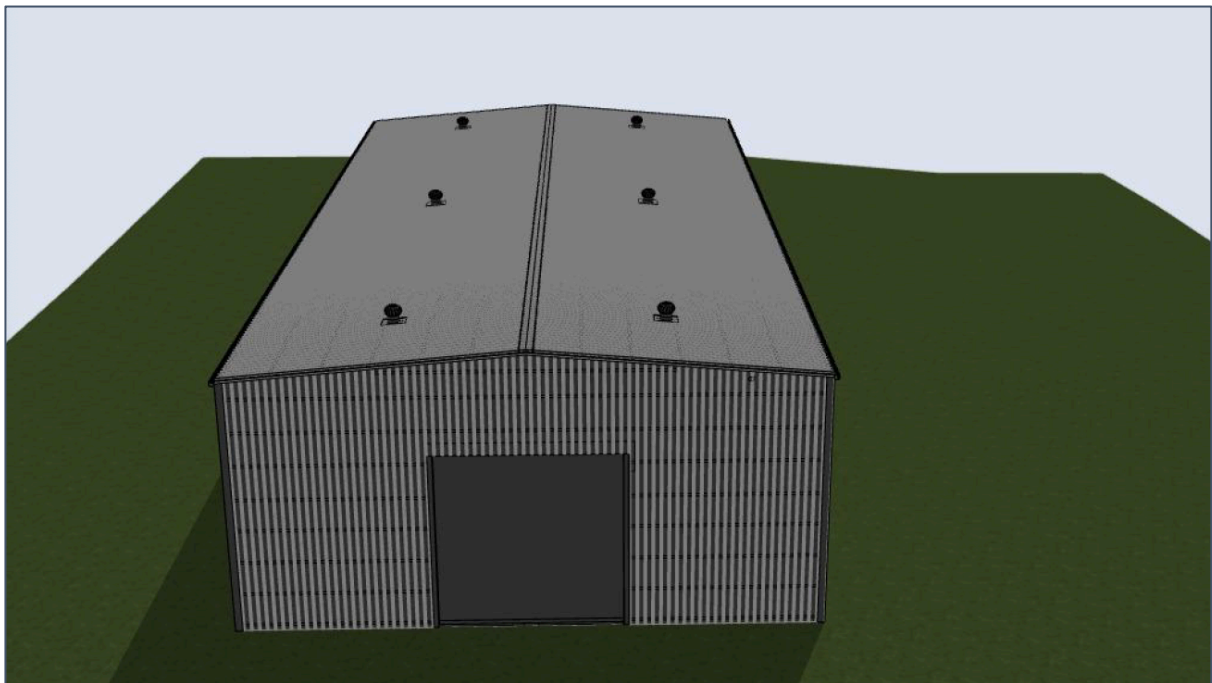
Proposed development as viewed from the street (Andy's Home Design, 2025)
